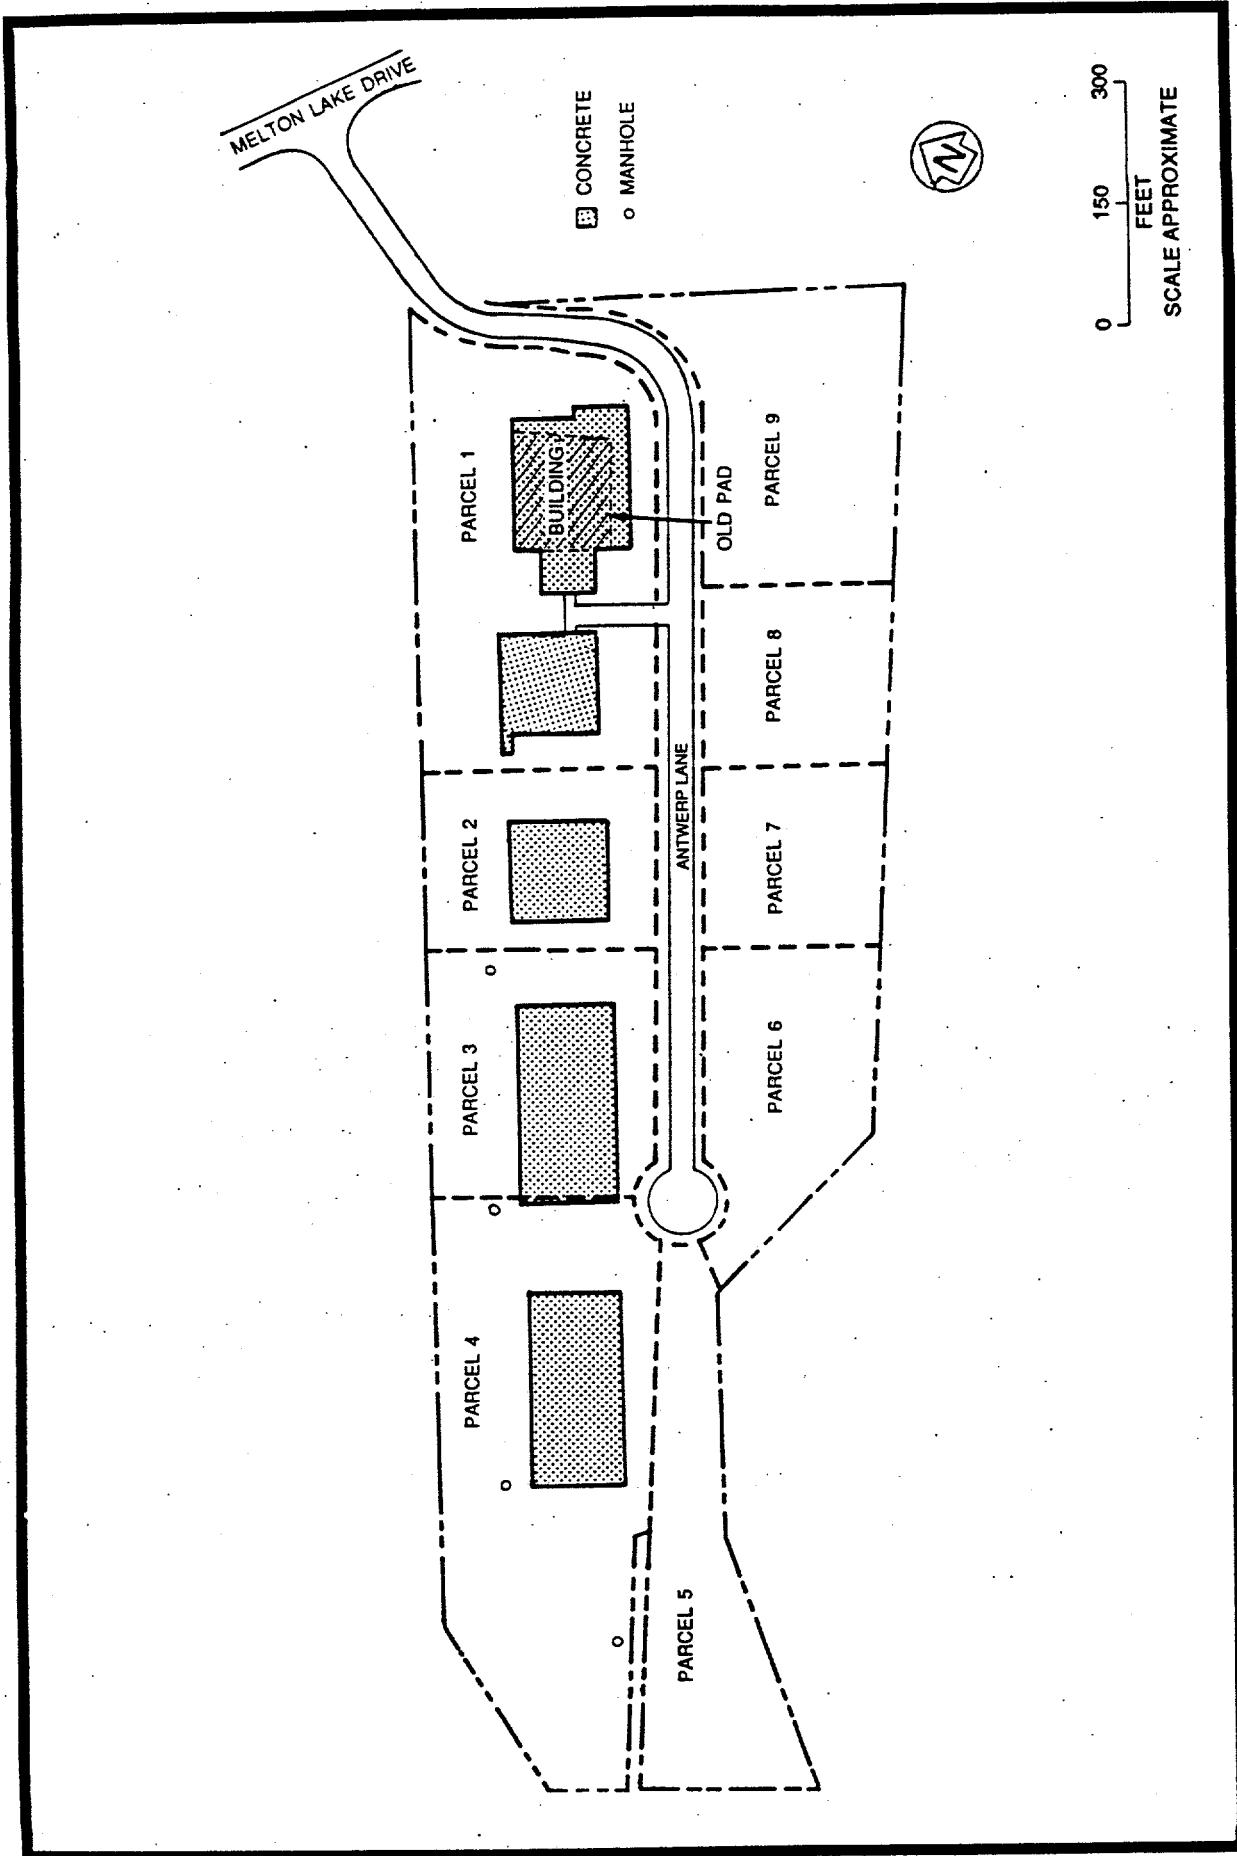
PLAN VIEW OF THE ELZA GATE SITE
